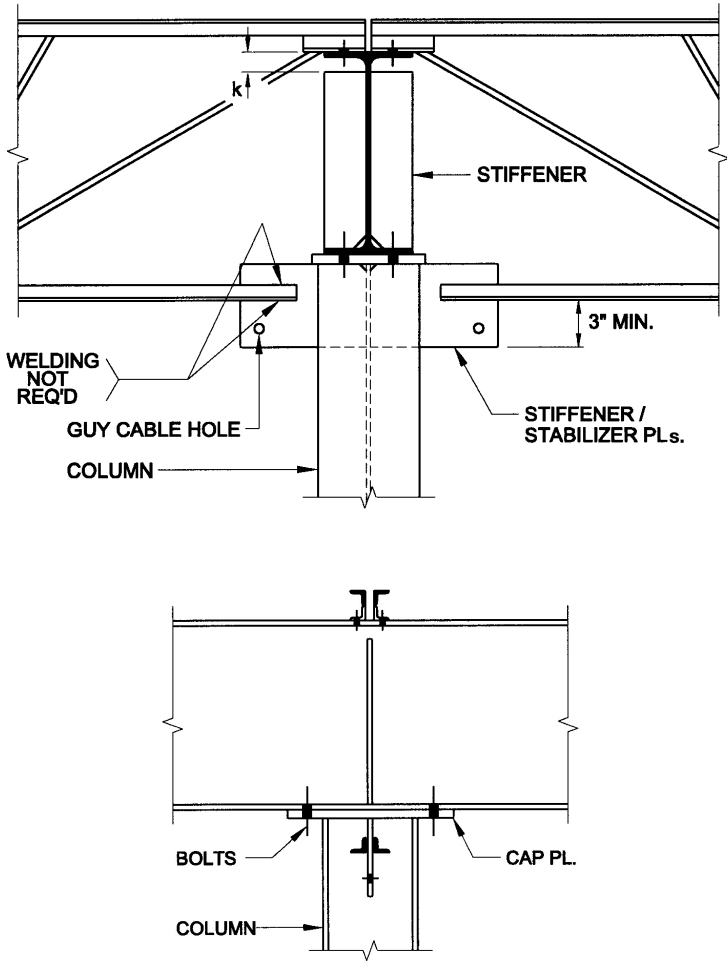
Beam framing continuously over column top, stability provided with transverse stiffeners, joist chord extensions located at column top not welded.
